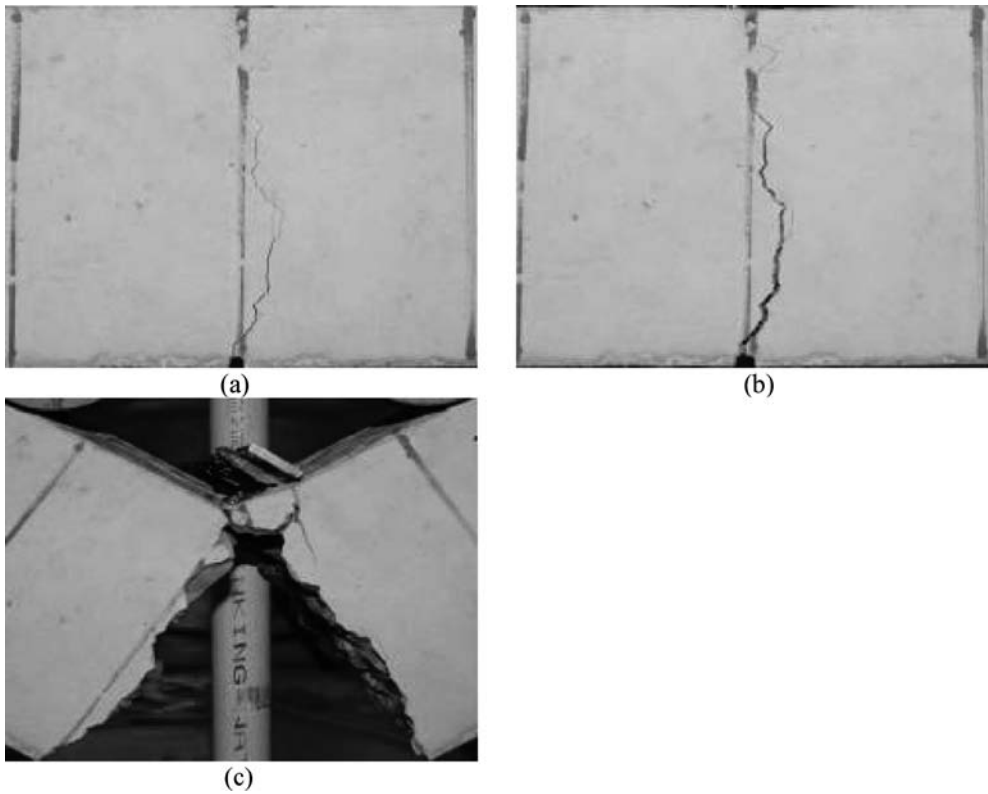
Failure mode of plain concrete beam: (a) Crack initiation; (b) Crack propagation; (c) Failure.
